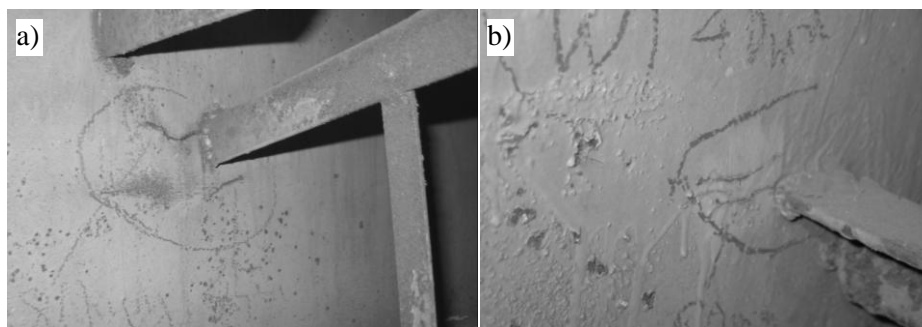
Cracks weld of the bridge beam stringer type „G” detected by the magnetic-powder method
